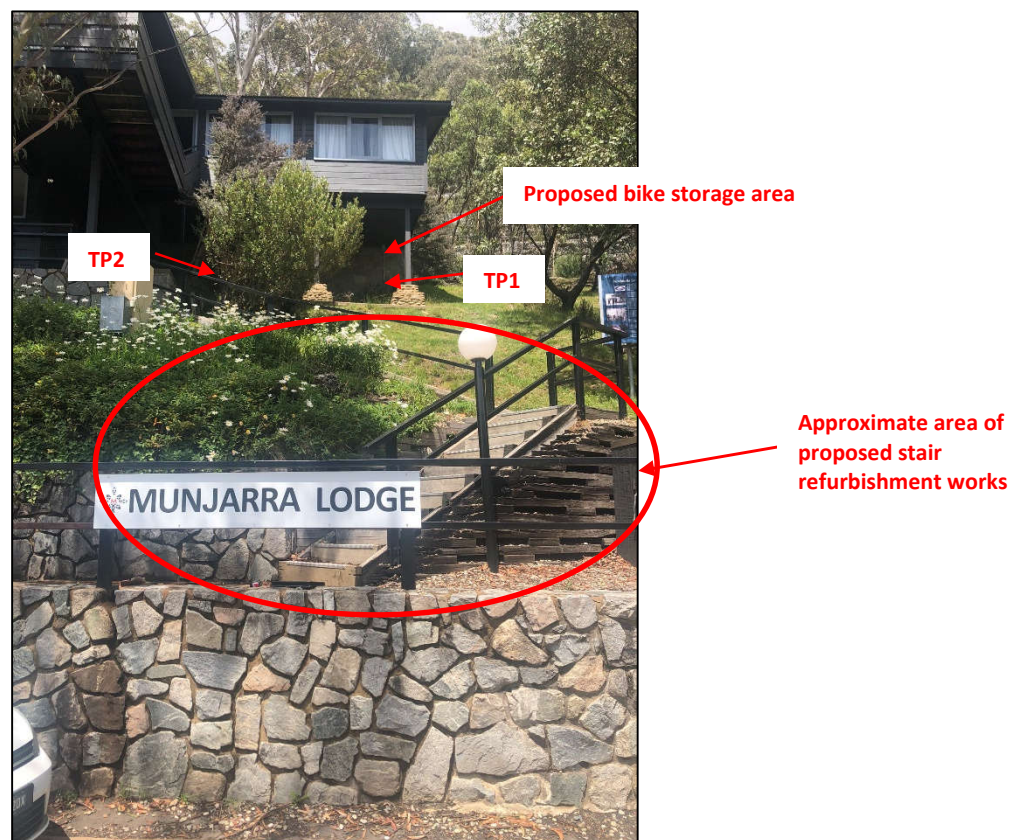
View looking south into the site from Bobuck Lane showing location of proposed works.
